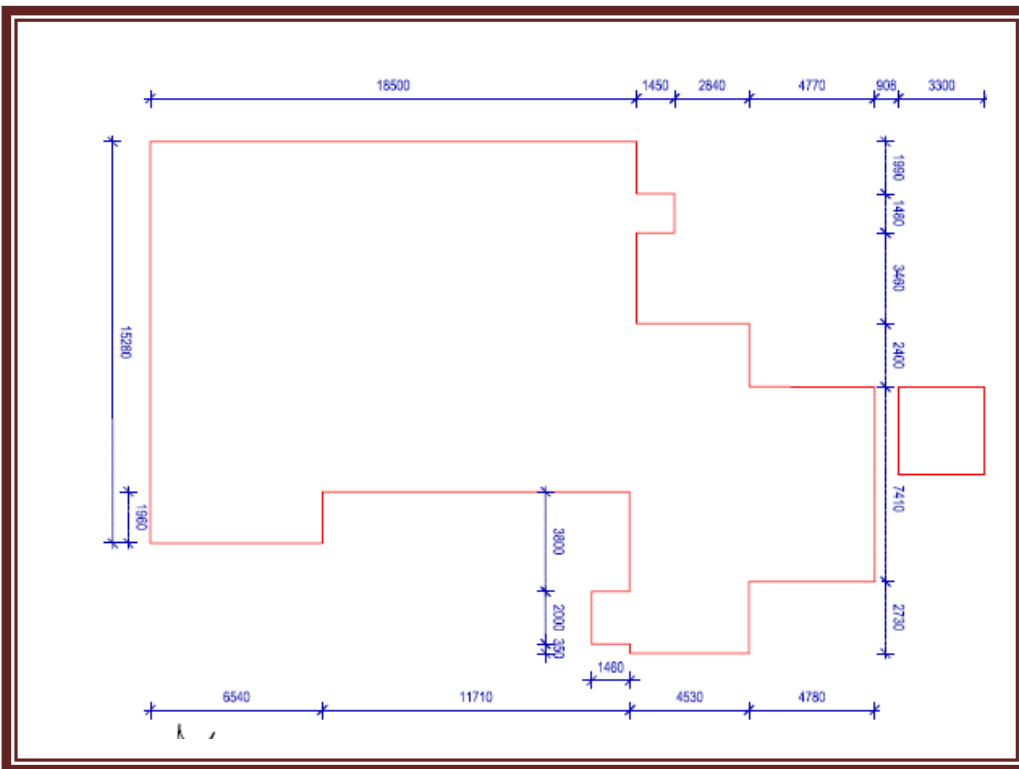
Floor plan ca. January 2011 showing later additions and asbestos tool shed.
